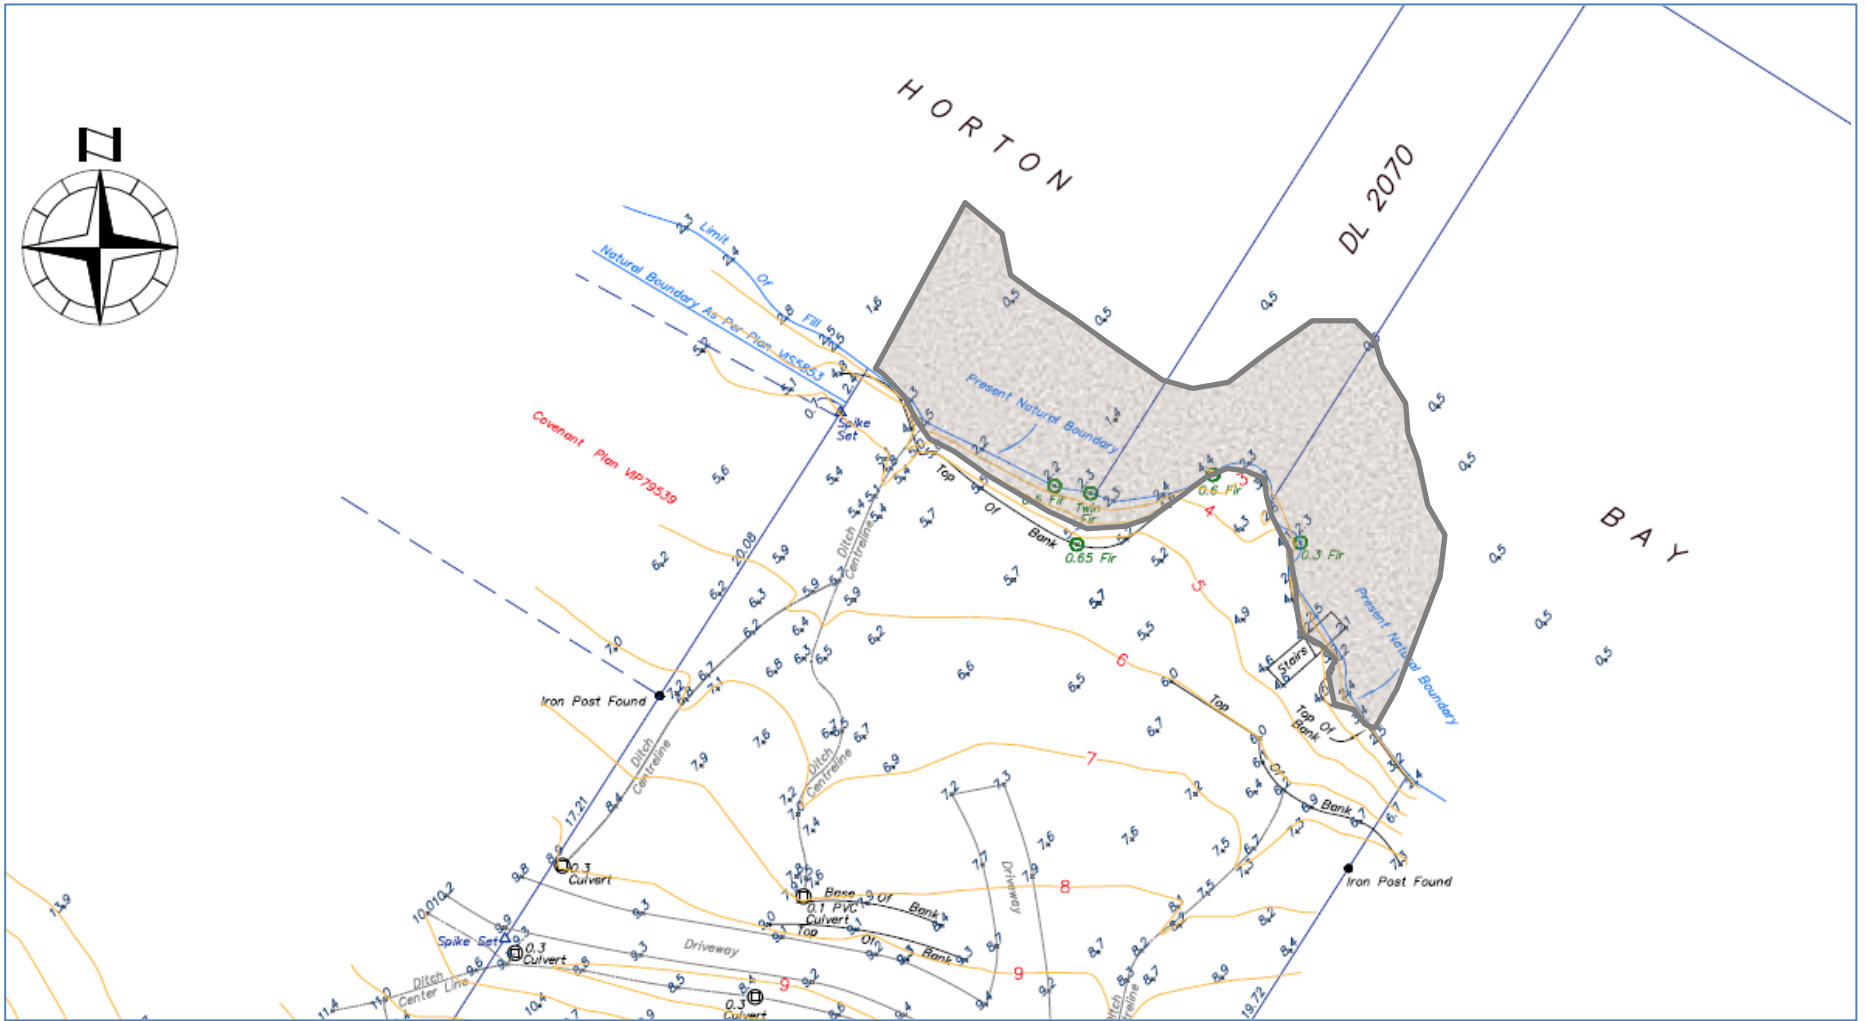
CRD Site Plan of Anson Rd, Mayne Island (Plan 21413) showing extent of proposed protective berm – approximately 10m seaward of *natural boundary*.
